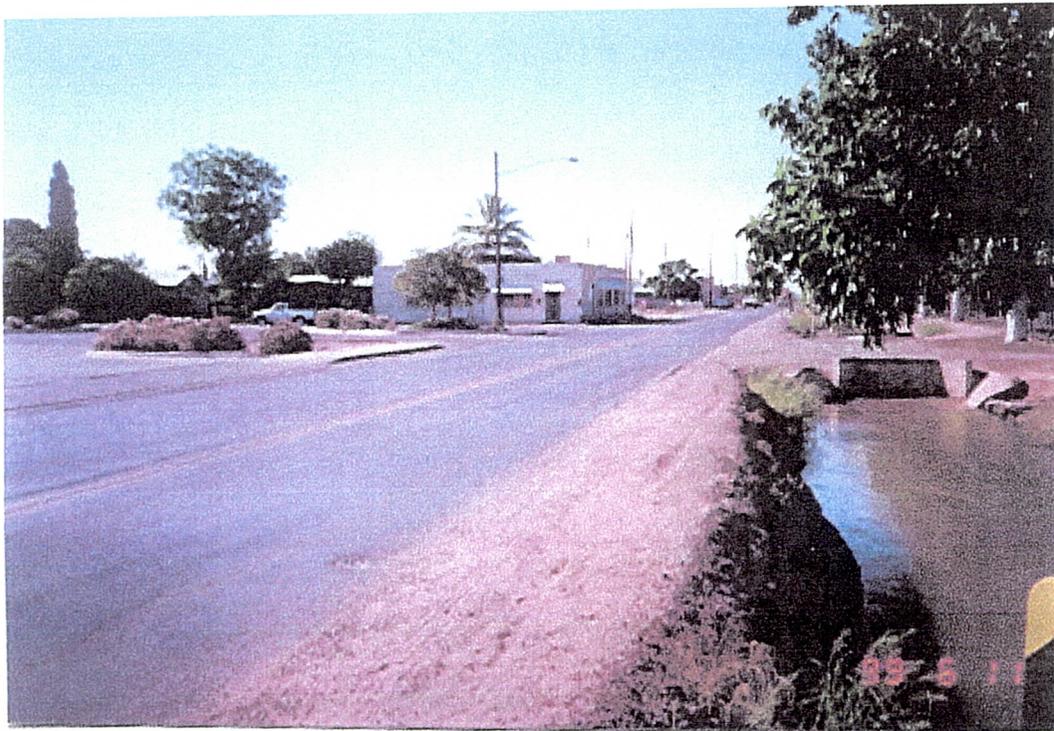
Van Buren Street crossing the RID Canal with a consistent grade from east to west (looking northeast).
